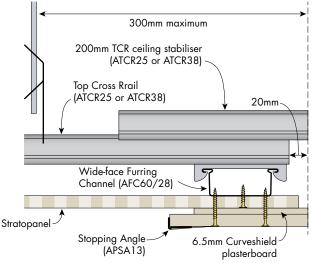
Perimeter Detail - Proud Shadow Border Stratopanel Suspended Ceiling Frame Section
